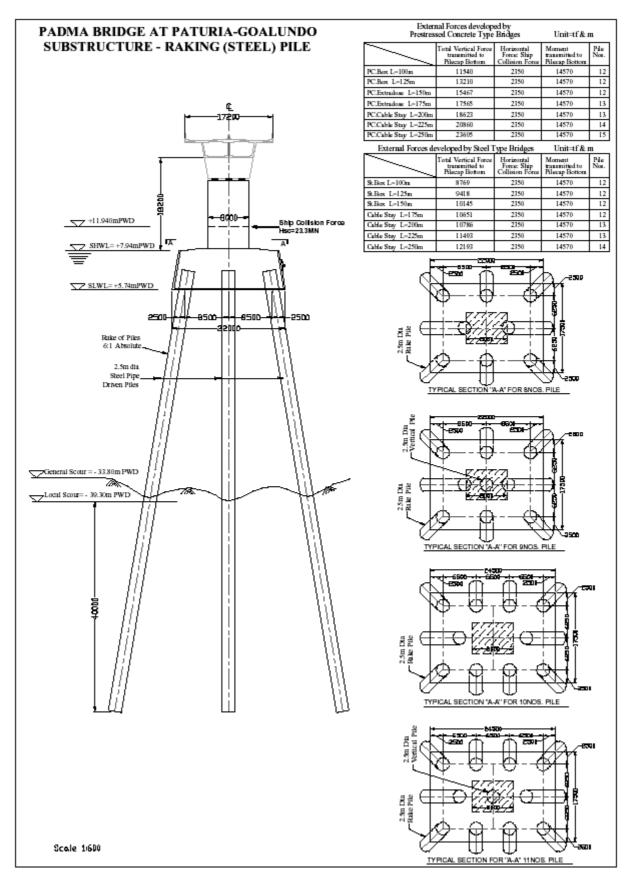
Paturia – Goalundo Site, Substructure with Raking Piles
